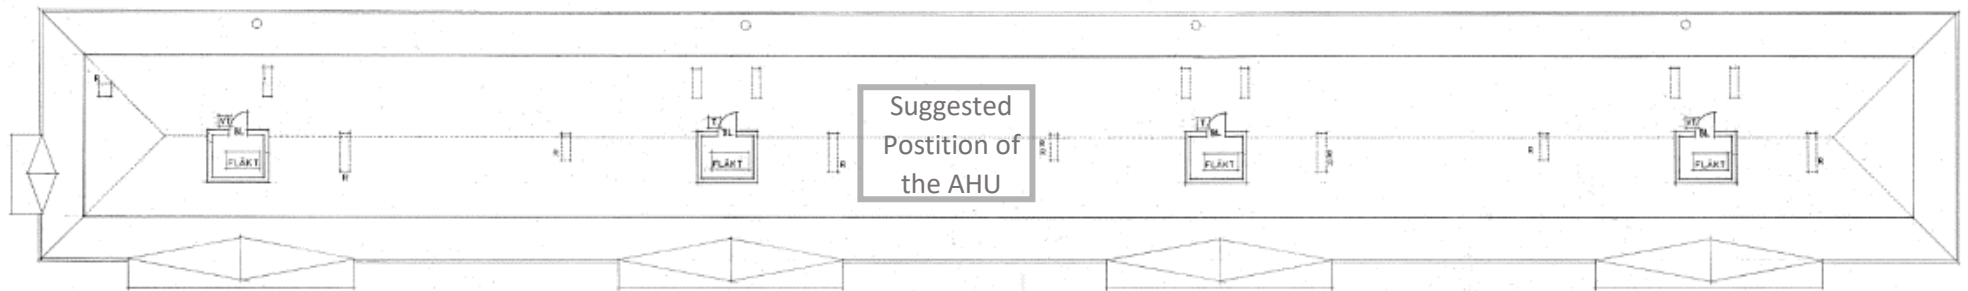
Floor layout of the attic floor of the studied reference building including the four ventilation shafts on the roof where the existing exhaust air fans are located. (Jansson & Persson, 1962)
